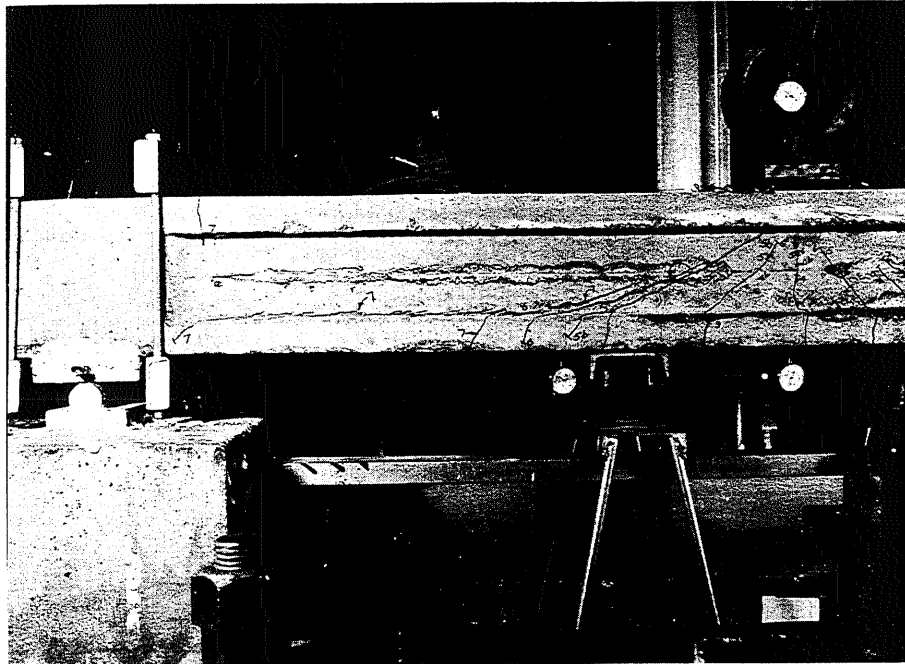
CRACKS SEPARATING TENSION FLANGE FROM WEB
